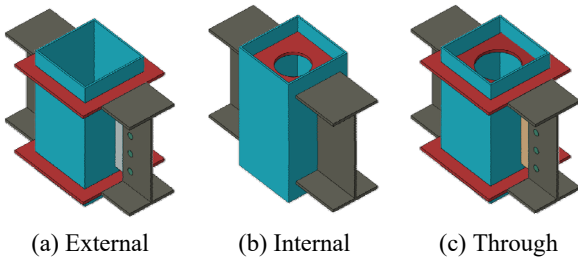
CFT column to H-steel beam connections commonly used in construction
